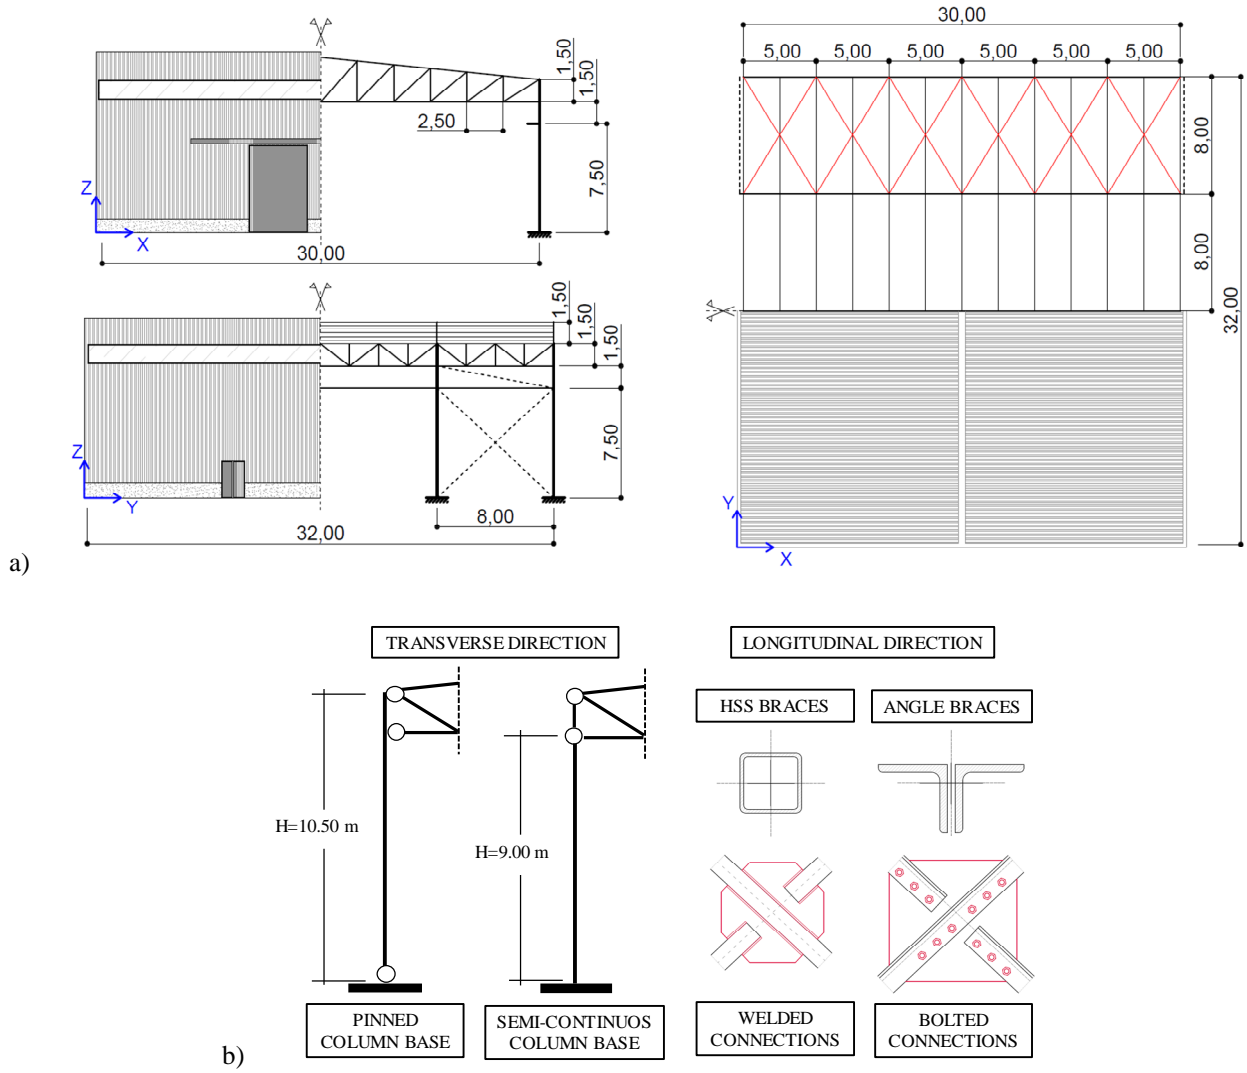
(a) Archetype buildings; (b) Structural schemes
